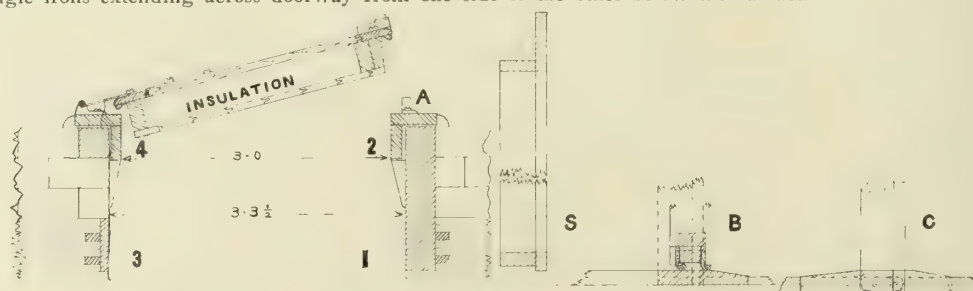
Fig. S shows doorframe with full standard sill and head used on all sizes of doorframes. Suited only to walking through.
